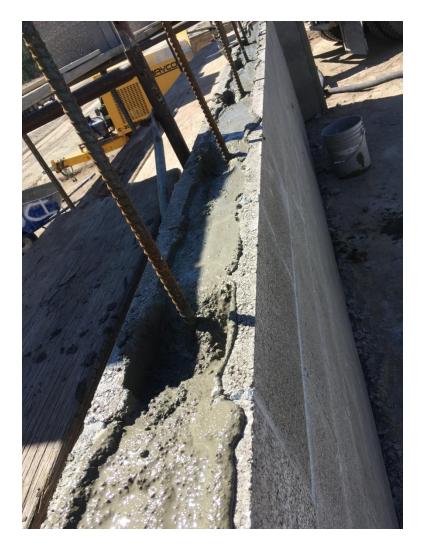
Concrete operations to fill in the chlorination building walls. Note that the rebar was position to stand vertically and in the center of the precast concrete blocks.
